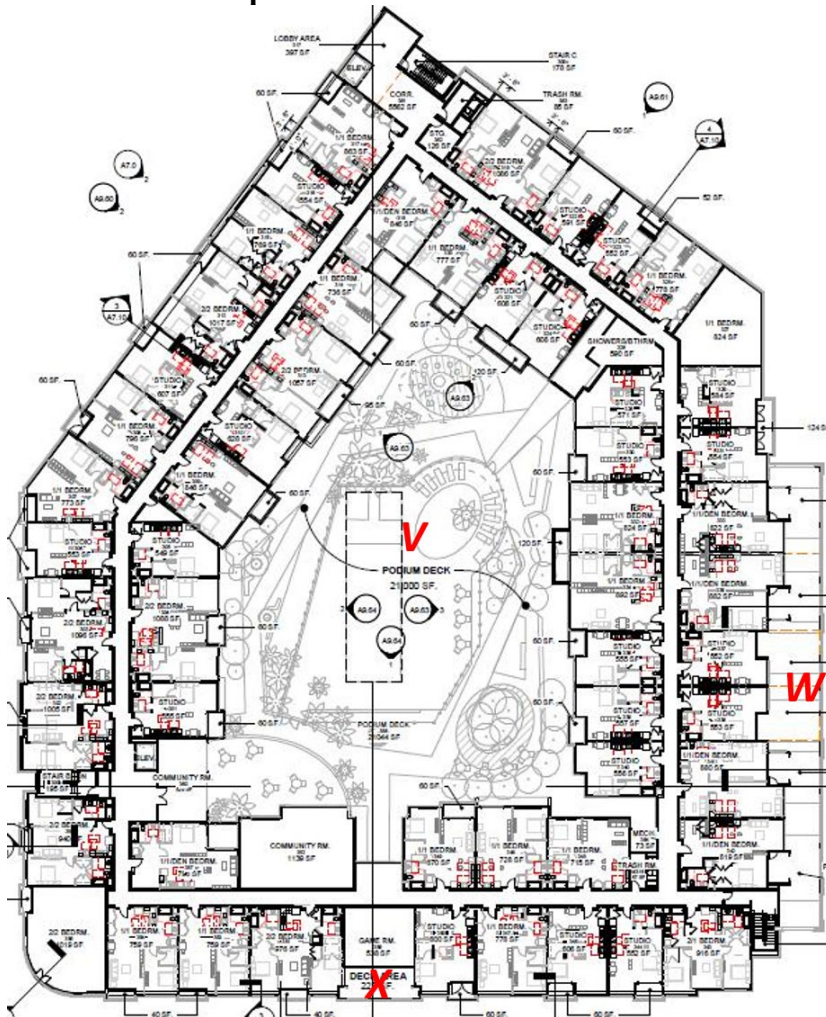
Proposed Outdoor Use Areas Located on the Ground Level
